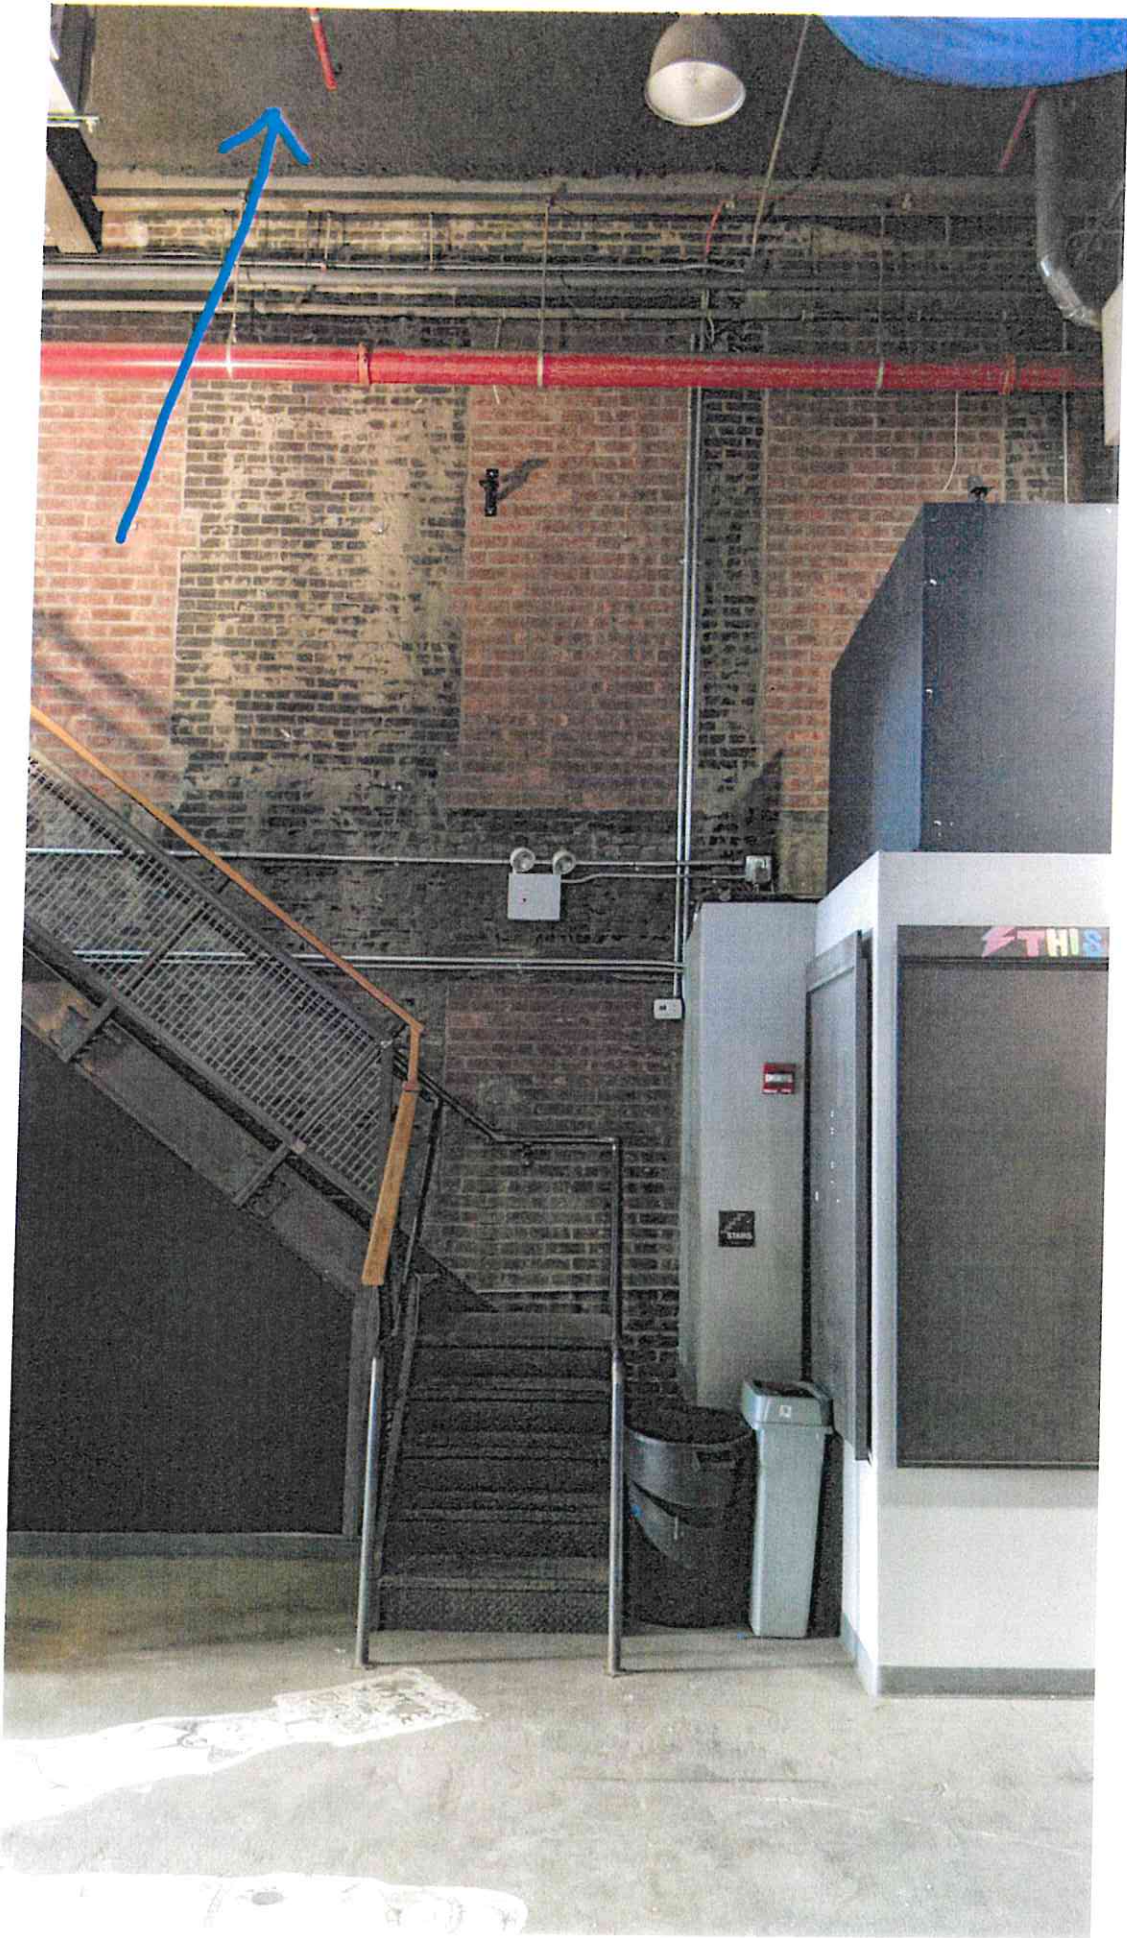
PHOTO SHOWING EXISTING K-13 SPRAY ACOUSTIC INSULATION
